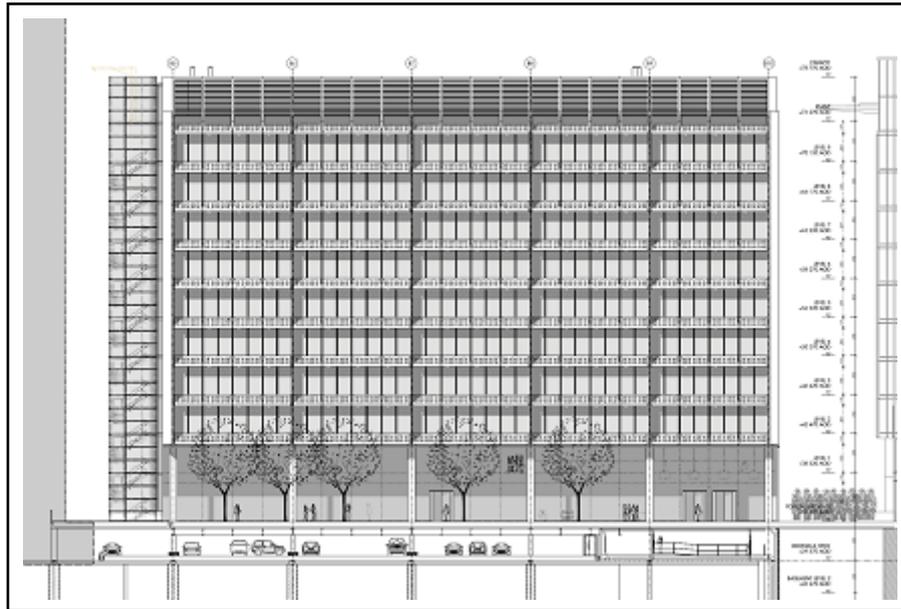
Elevation of the 12-storey 4 Kingdom Street development
